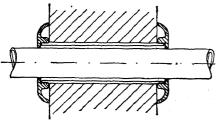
Sectional arrangement of pipe sleeves and Hall's thimbles
